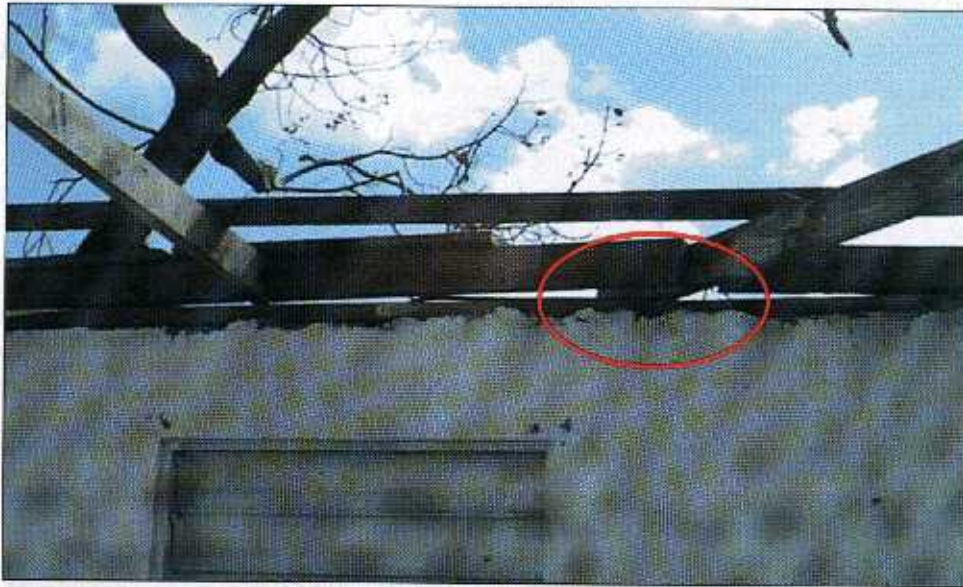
Typical nail withdrawal failure in a wood-frame structure supported by a masonry wall with little uplift capacity at the connection.
